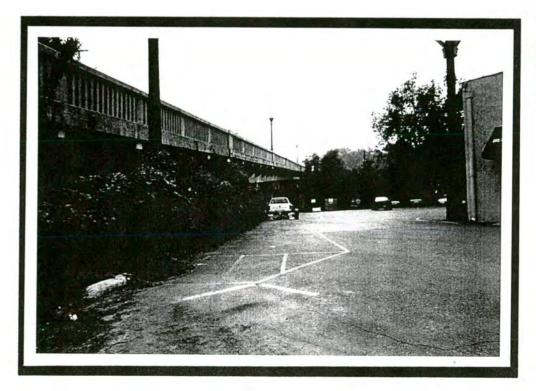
McDowell Street Viaduct (# 1) Looking Northwest
